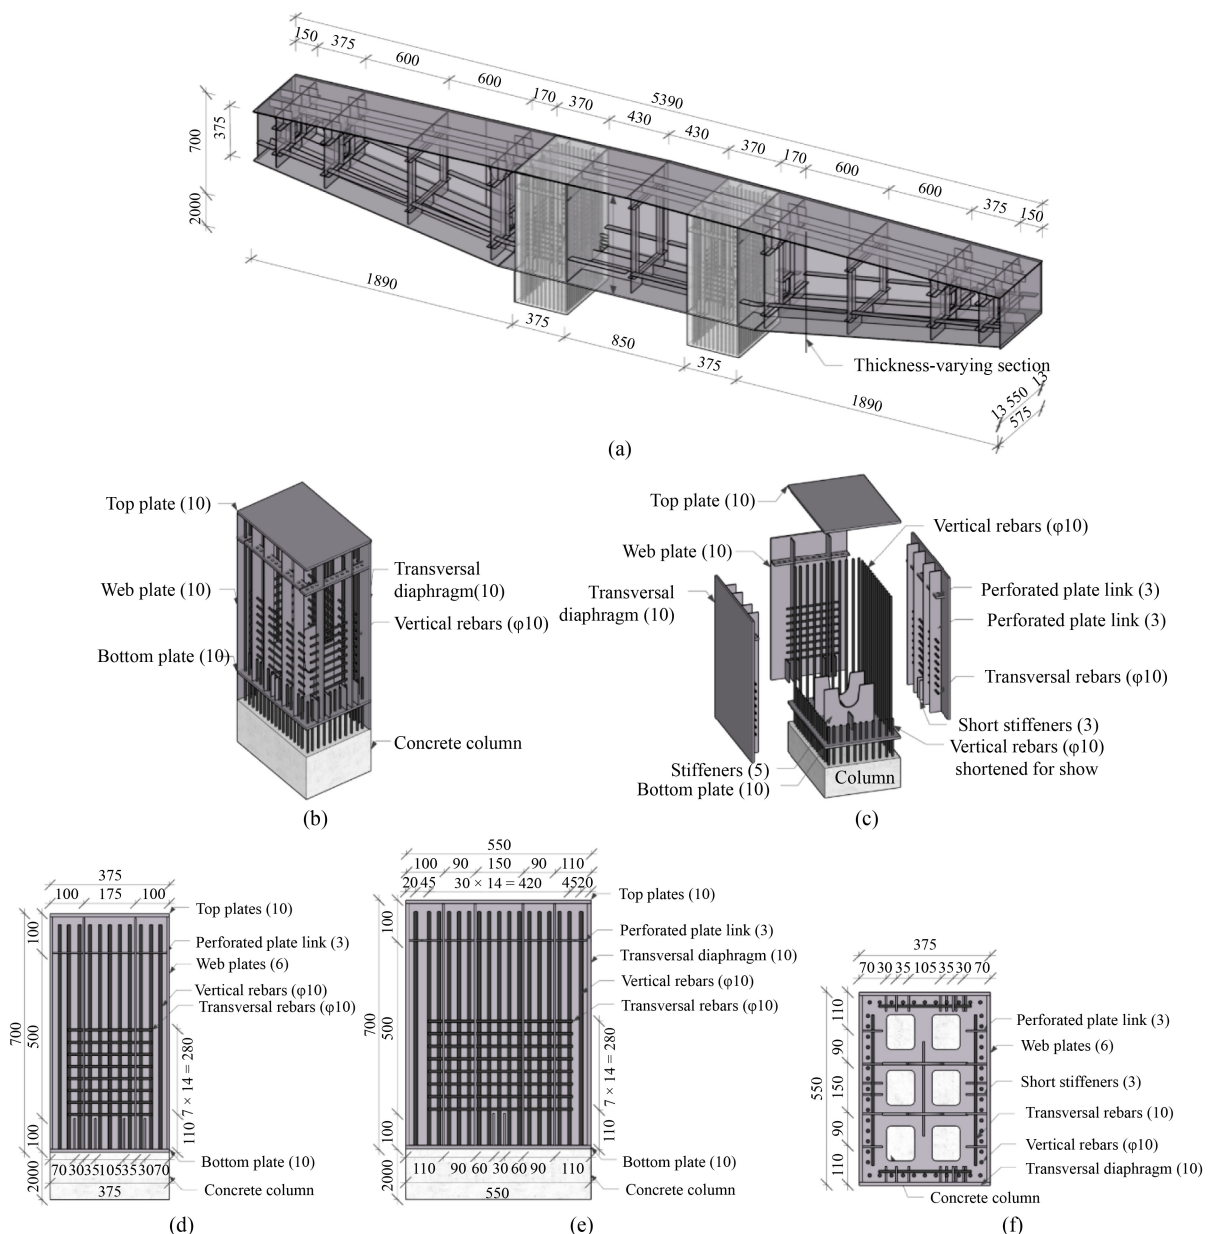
The rebar-concrete connection (unit: mm): (a) the steel cap beam of specimen S2; (b) overall design; (c) construction; (d) side view; (e) front view; (f) plan view.
